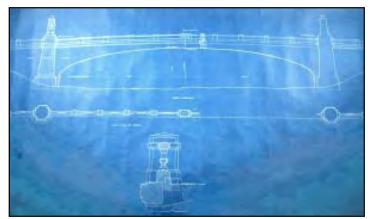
Elevation of Midlake Bridge, by Walter Cook, Plan #2121-641, sheet 1, 28 March 1904. Source: ONHS.
